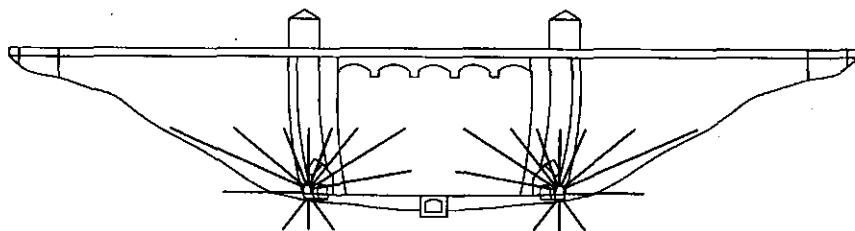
Drain Borings inside the Fürwigge Dam (Scheme)
